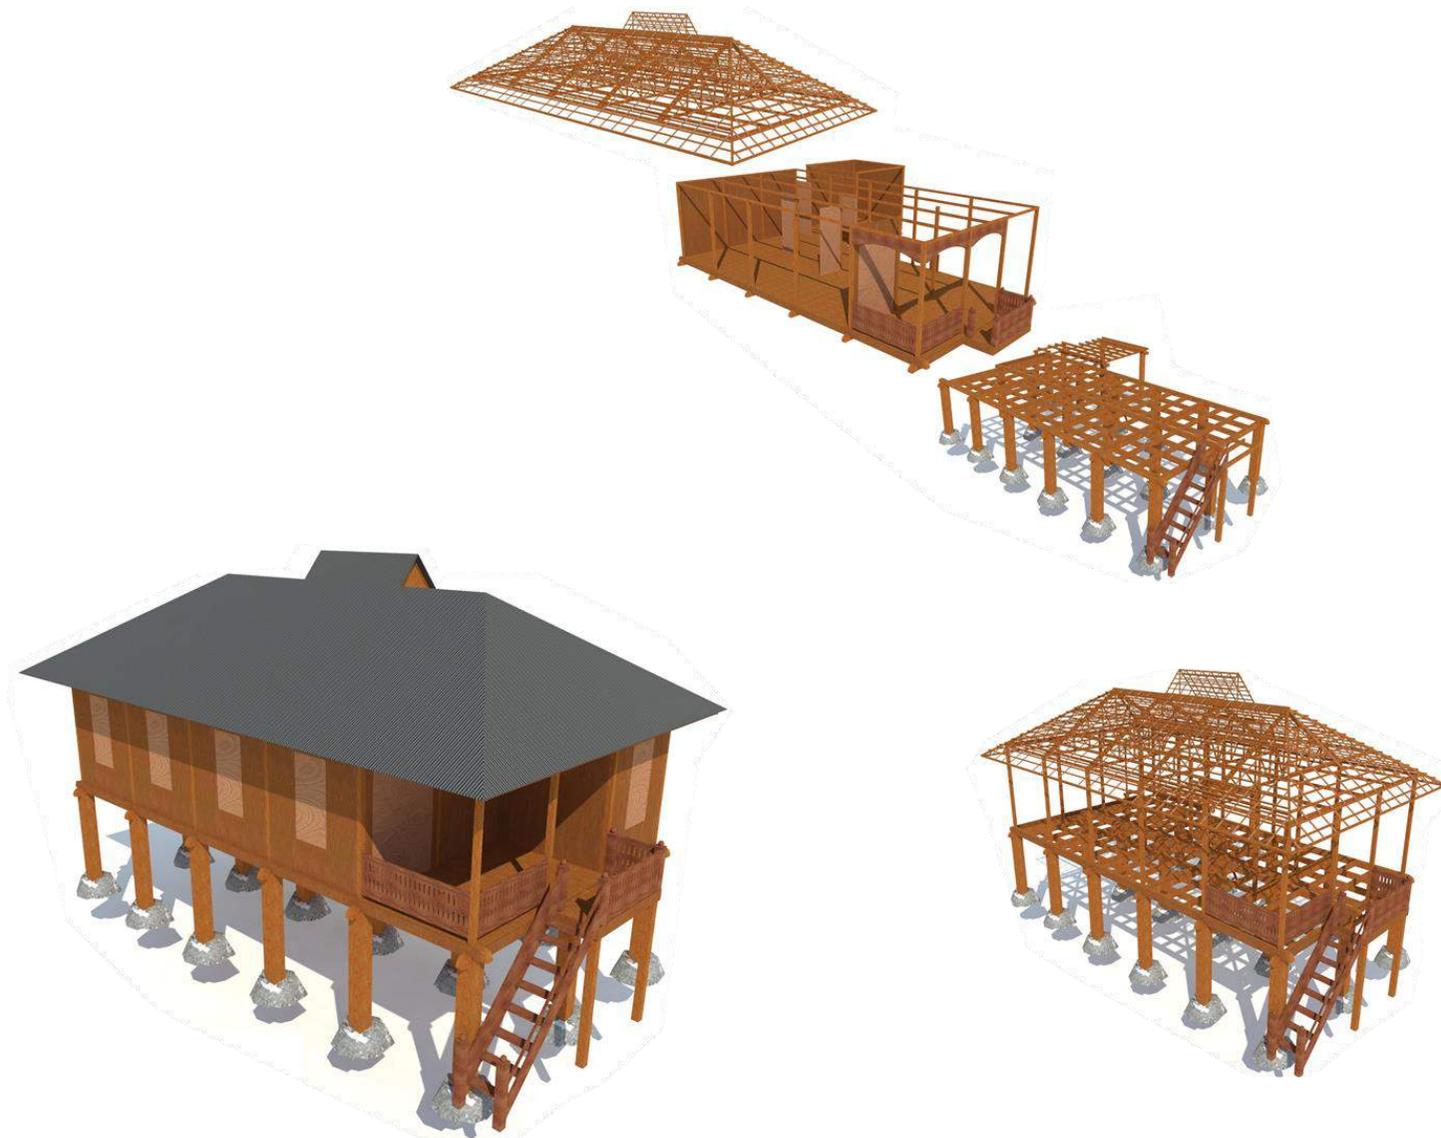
The detailed construction of a traditional house in Bangke village (Example 2) with one level of the roof. Source: Author, 2018
